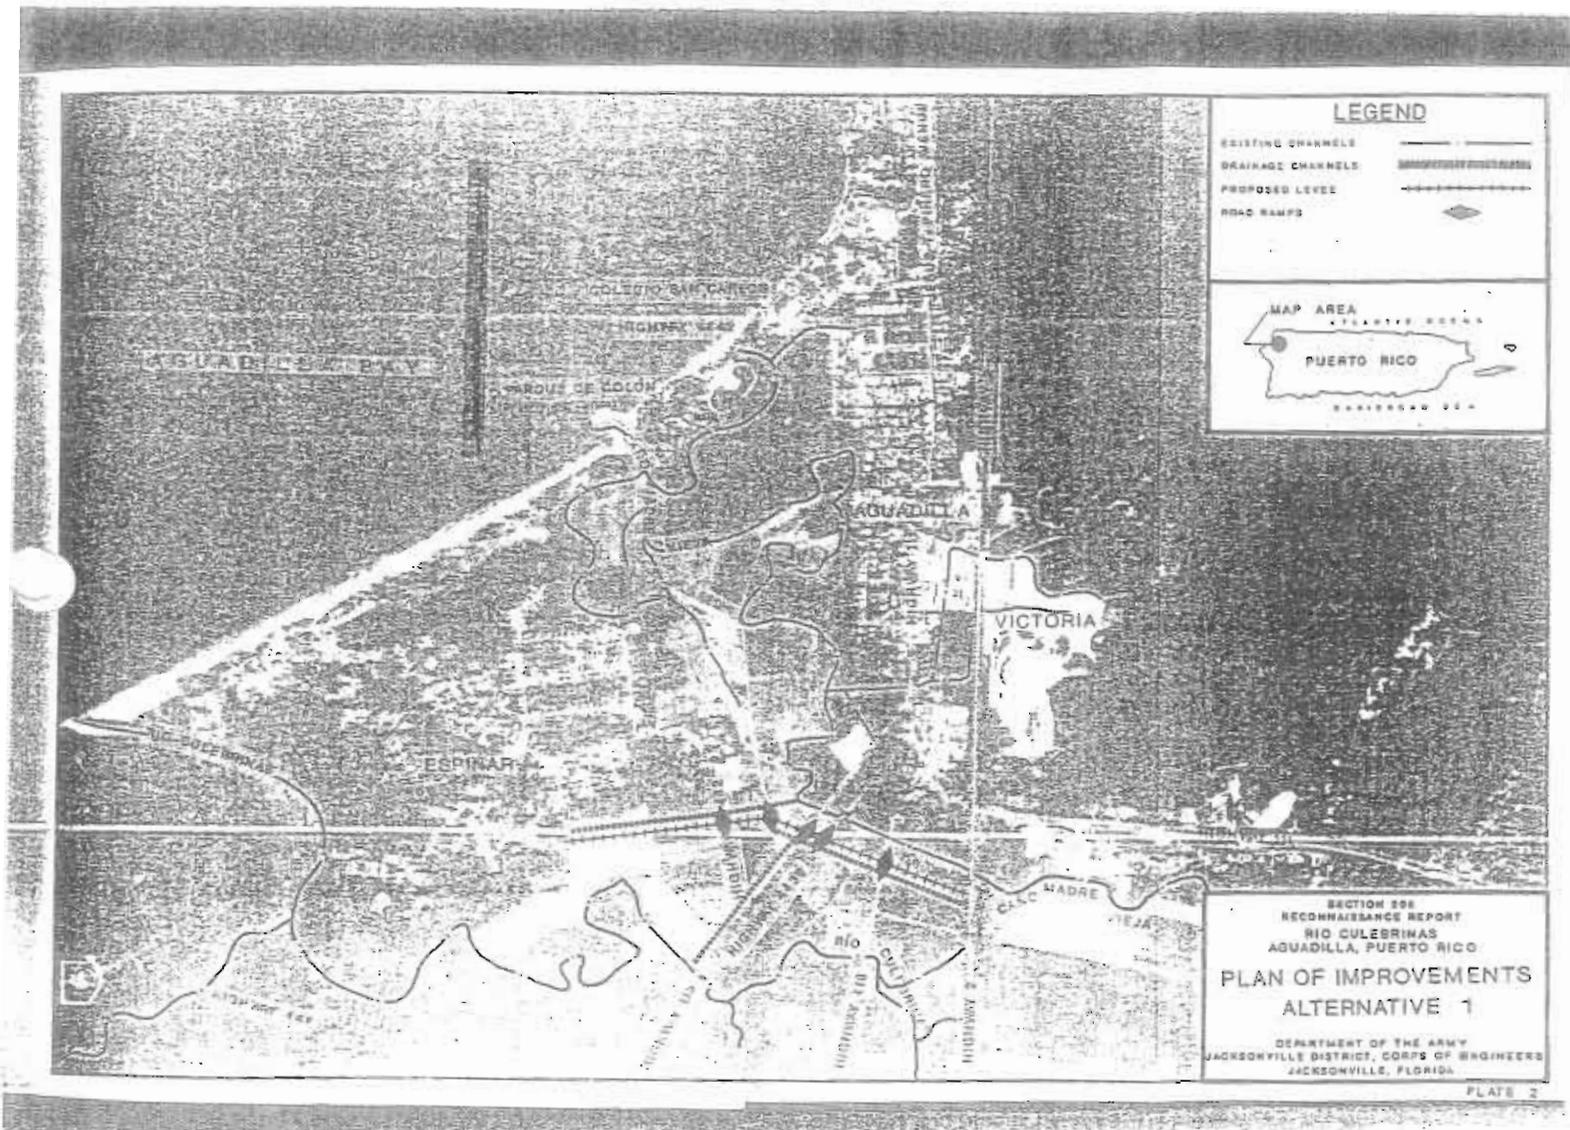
Original alternative 1 from Section 205 Reconnaissance Report, 1992.
